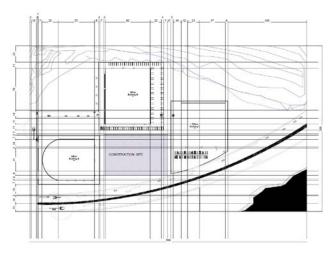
Plan for site with grid-to-grid distance for better understanding the dimensions.
